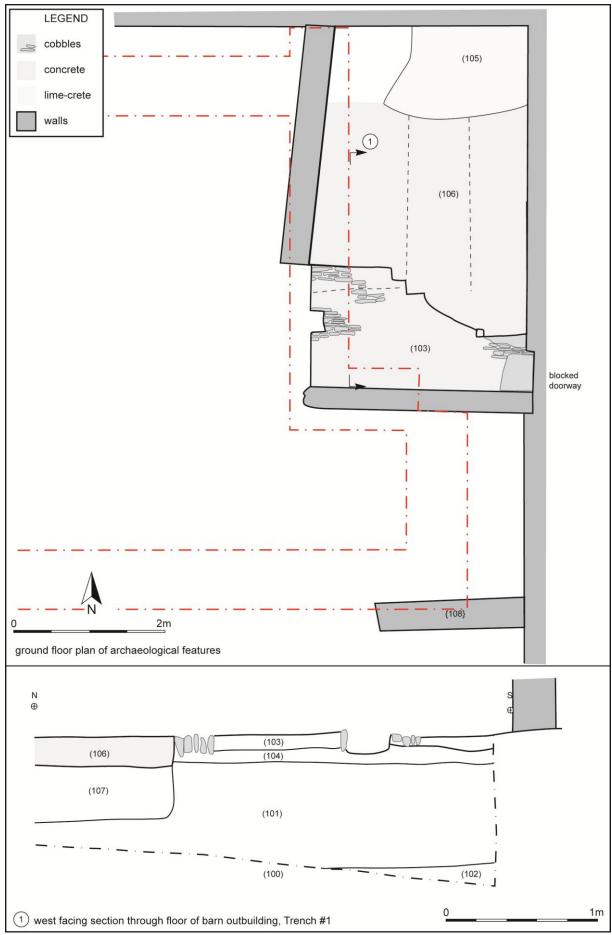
EXCAVATION PLANS AND SECTIONS.
